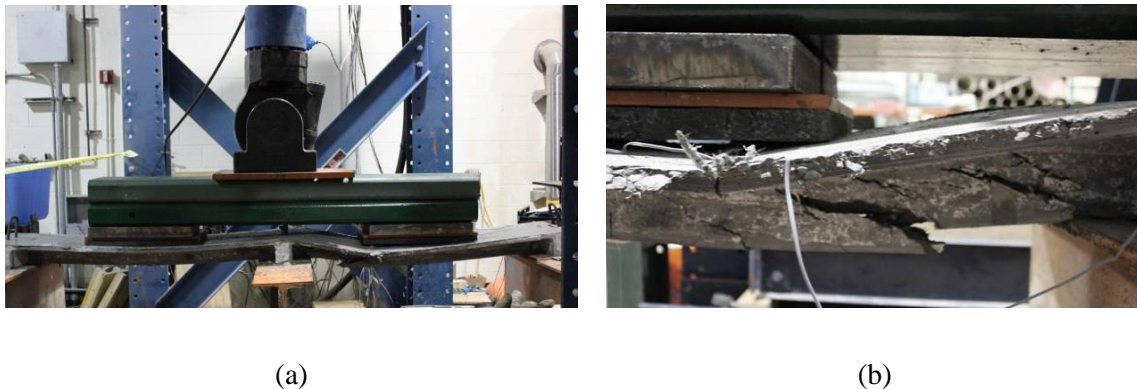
Failure Mode of Specimen 1T2S: (a) Deflected Shape, and (b) Shear Crack
